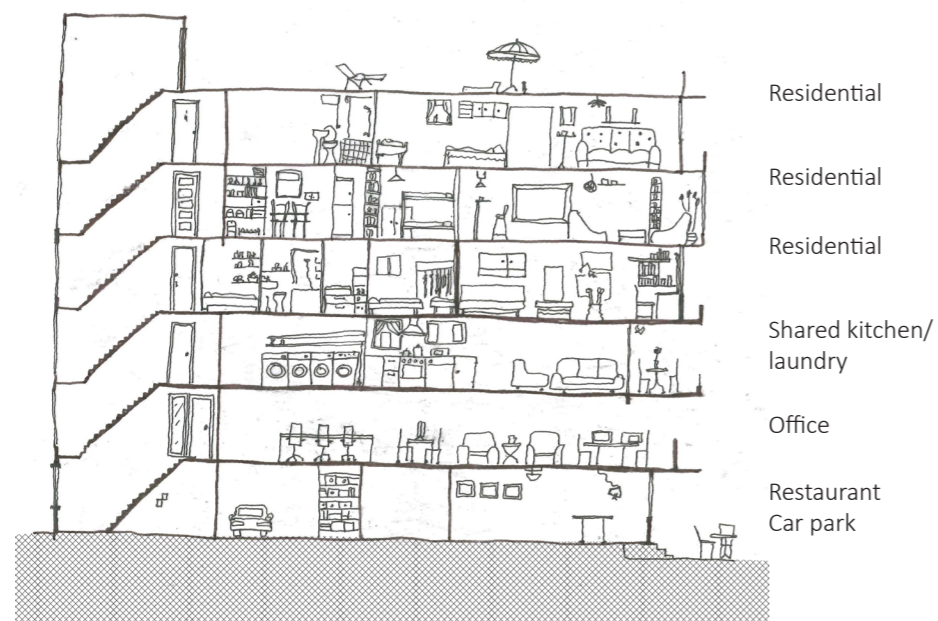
| Zoning within the building can restrict people sleeping at the ground floor. If a flood would occur unexpected the people living there are still safe. Moreover this allows a facade that is adapted to the wet-proofing options.
